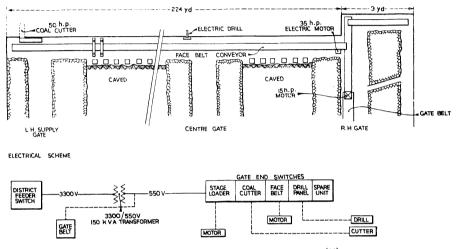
Conventional long-wall face layout.⁽¹⁴⁾
